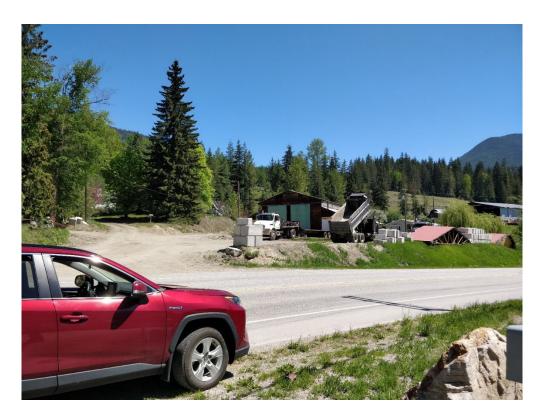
View of proposed concrete batch plant location from Hwy 6
